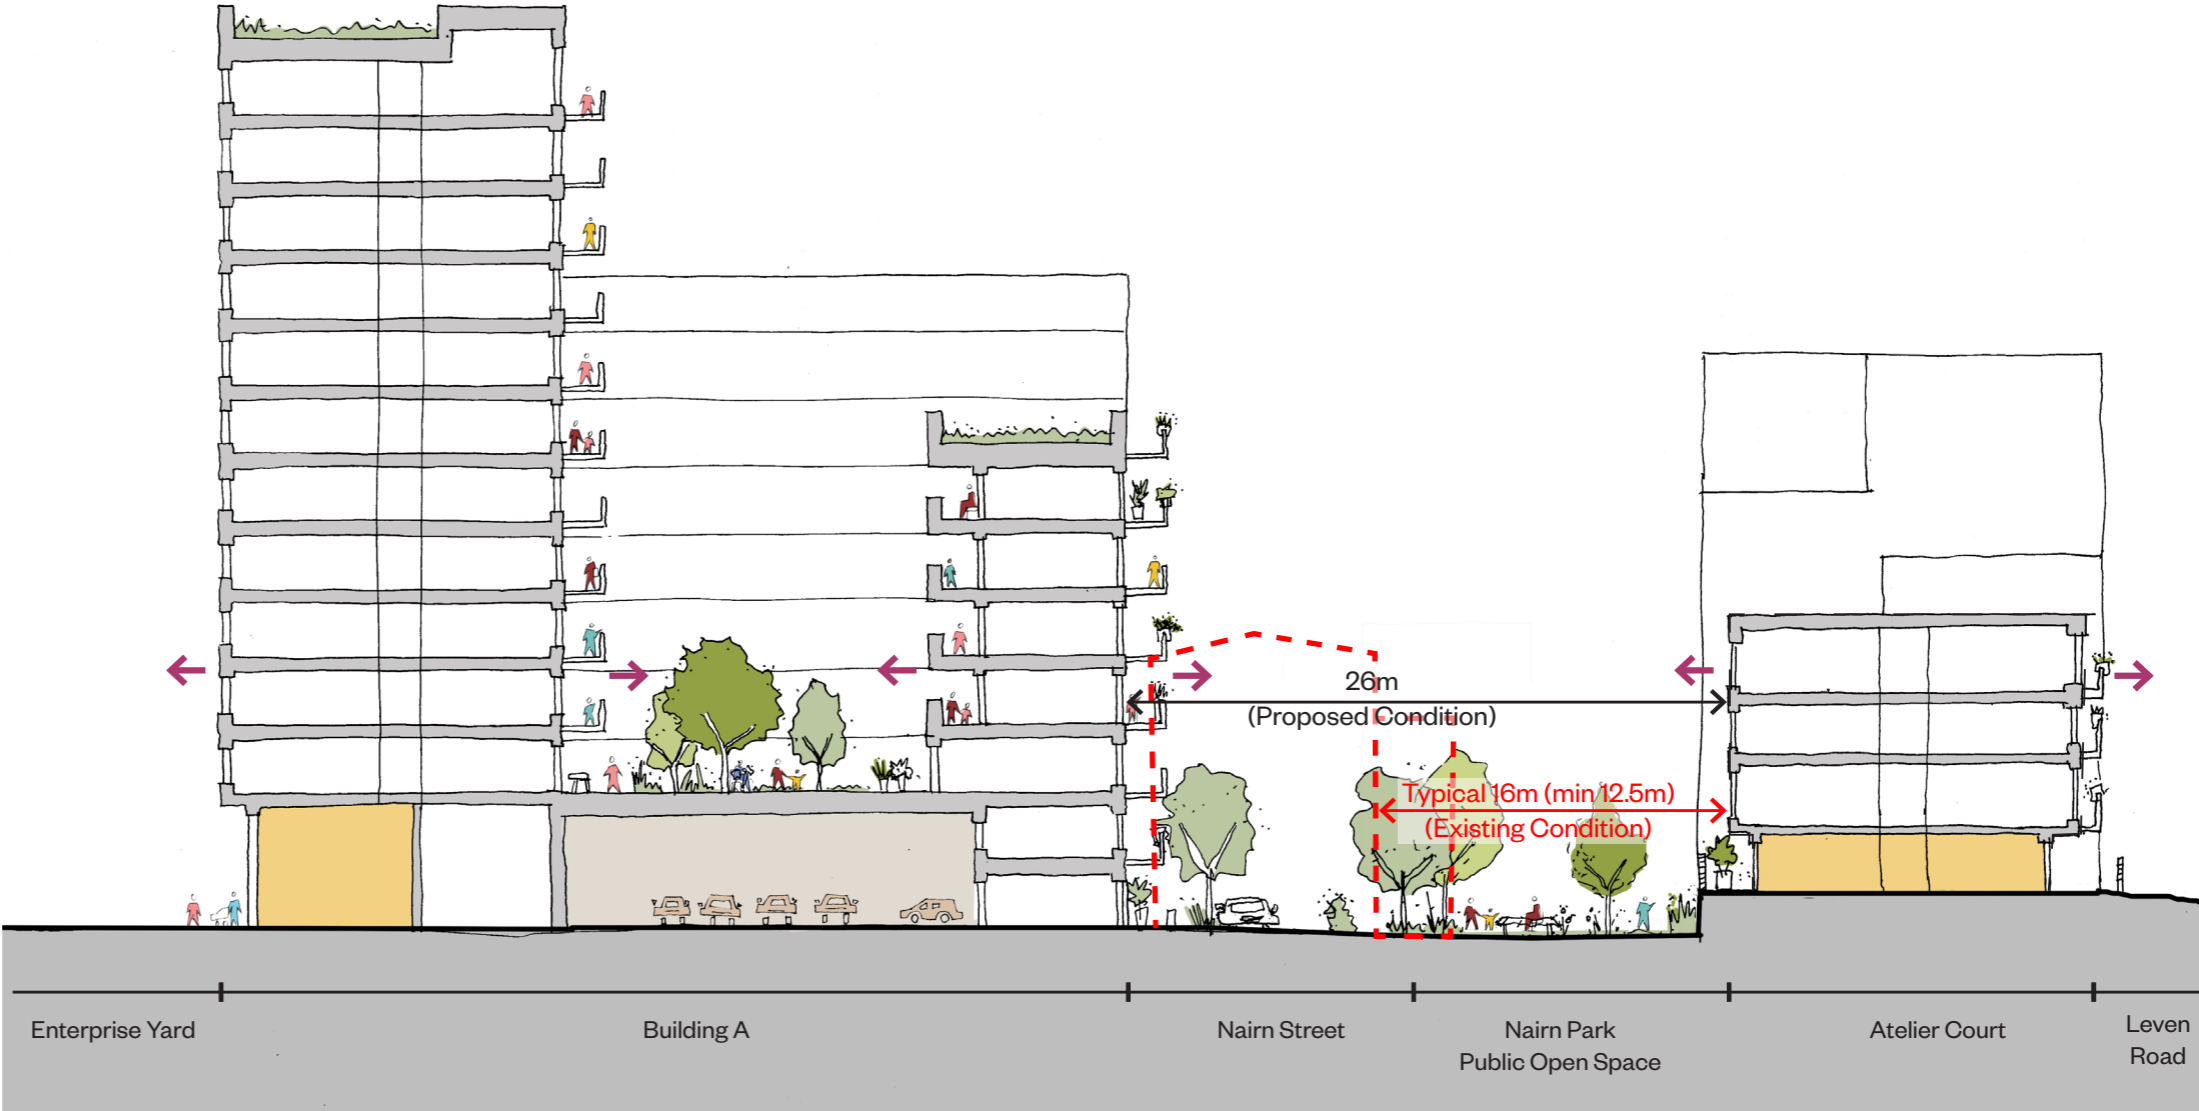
Sketch section cutting east-west through the northern part of the Site - Illustrative Scheme
